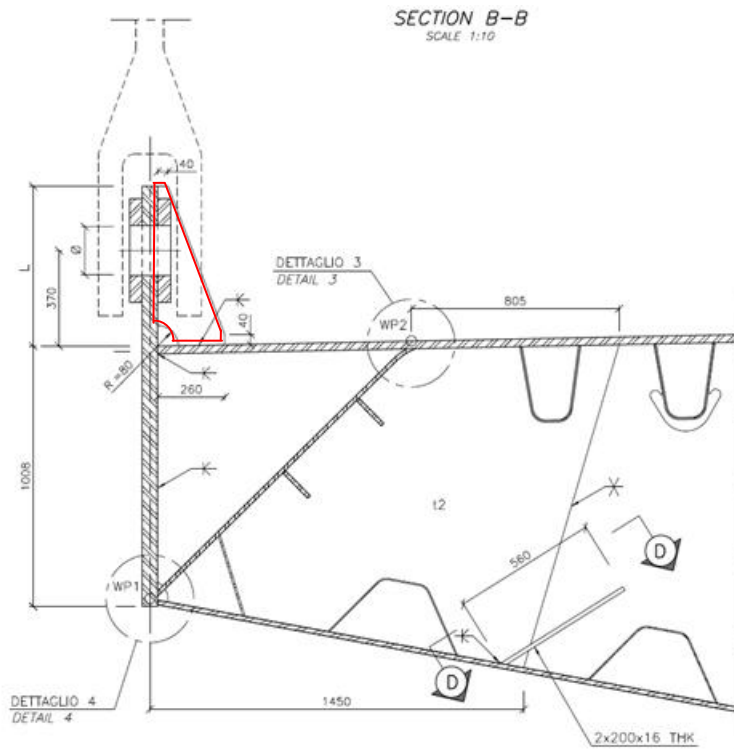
Section at the hanger anchorage showing the available steel for the bolted connection detail
